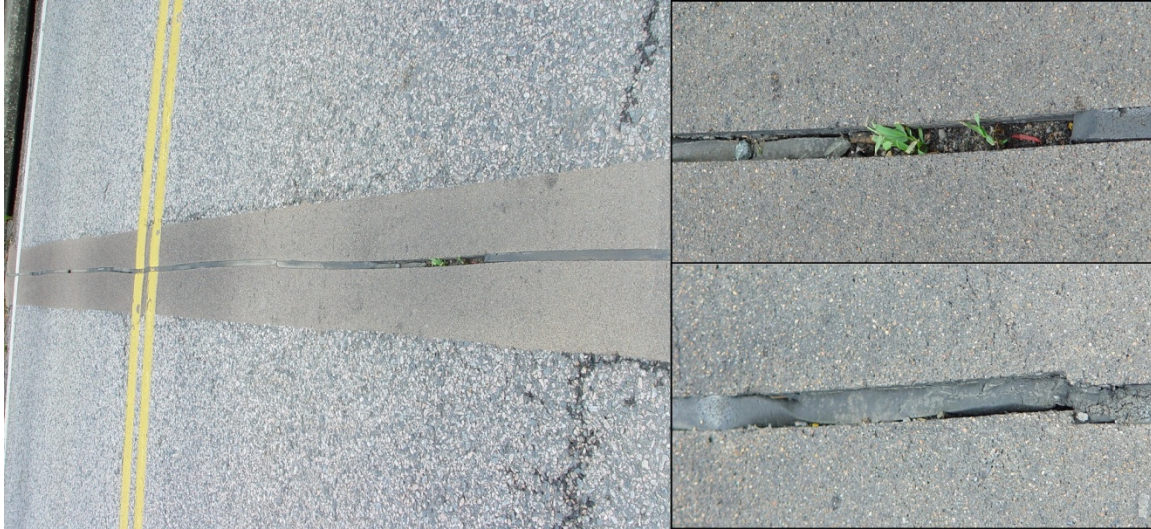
Transverse Joint of Qualla Road Bridge Repaired With Concrete and Sealant
